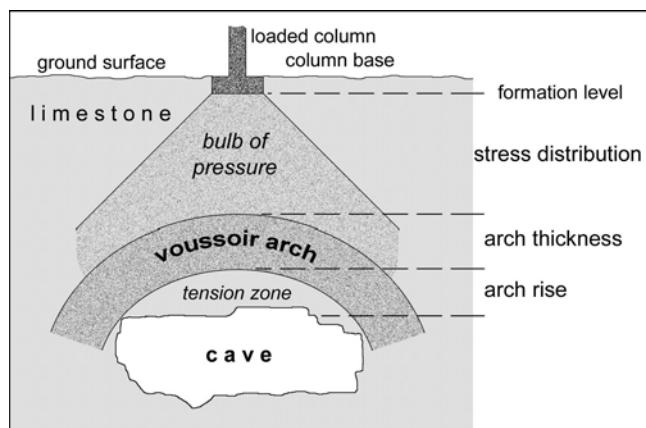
Elements of a voussoir arch developed in a fractured rock mass that spans a natural cave and carries additional load imposed by engineering works.
